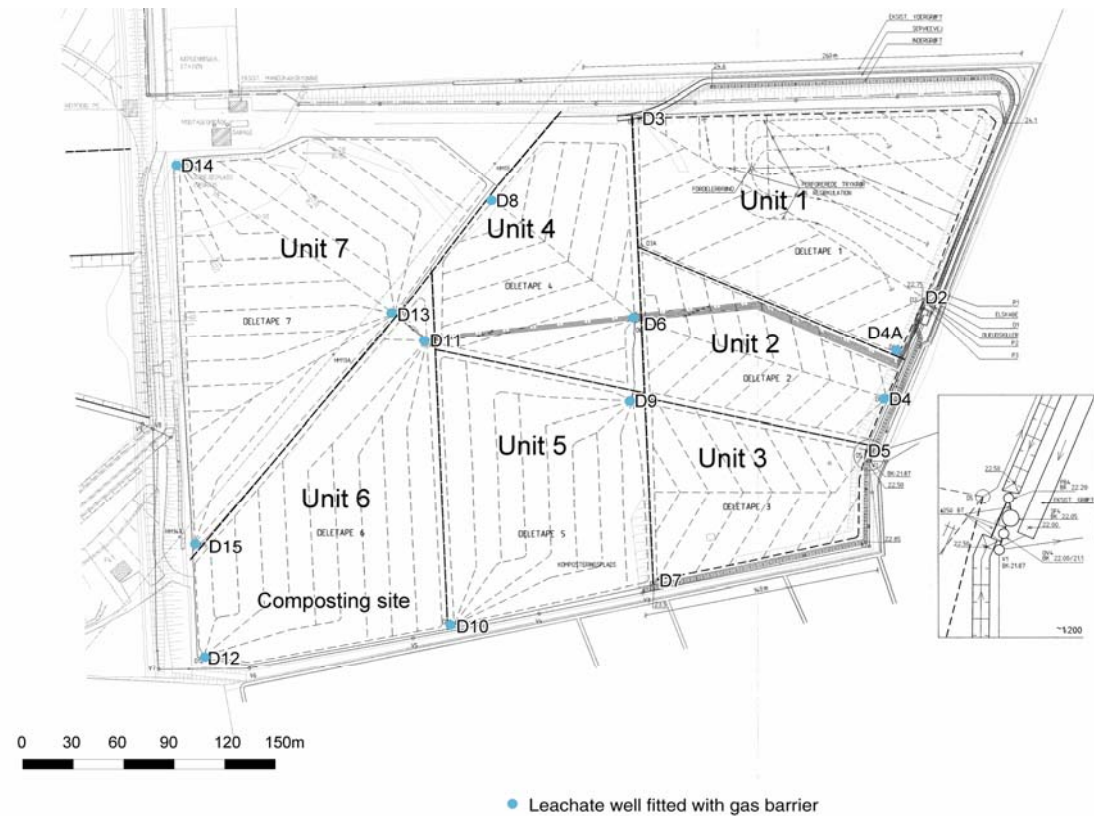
Leachate well gas barriers to be installed at Fakse landfill.
